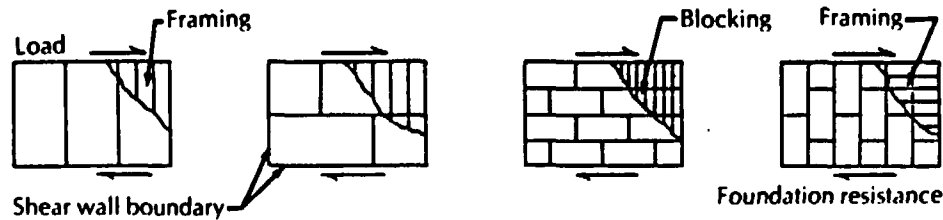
Working Stresses for Plywood Sheathed Wood Stud Walls
